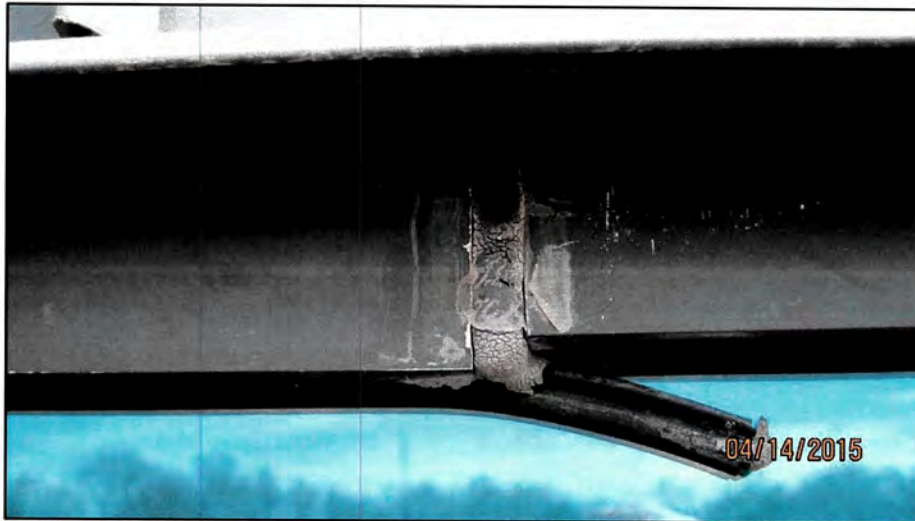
East Elevation, the control joints and gaskets around the exterior windows are separated in multiple locations.
